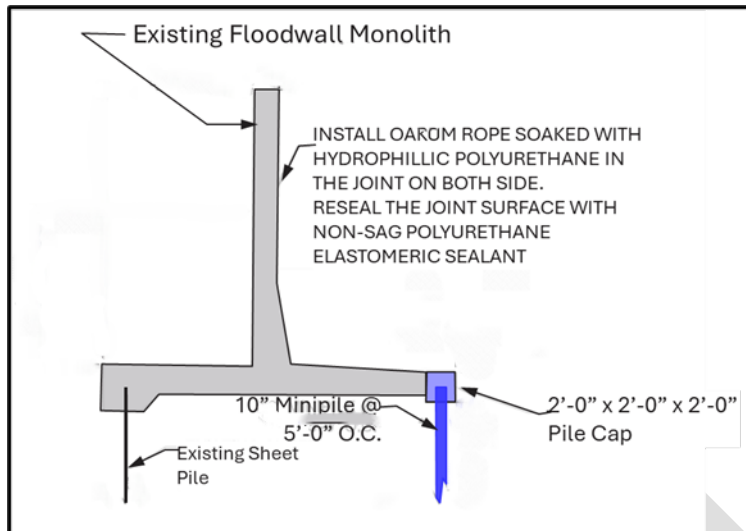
Proposed Mini Pile Design to be Attached to Existing Floodwall Monolith at the Dutch Point Flood Wall Location, Hartford
